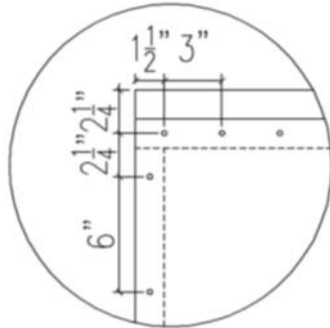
Shear wall construction drawing, single bottom plate or double bottom plate
